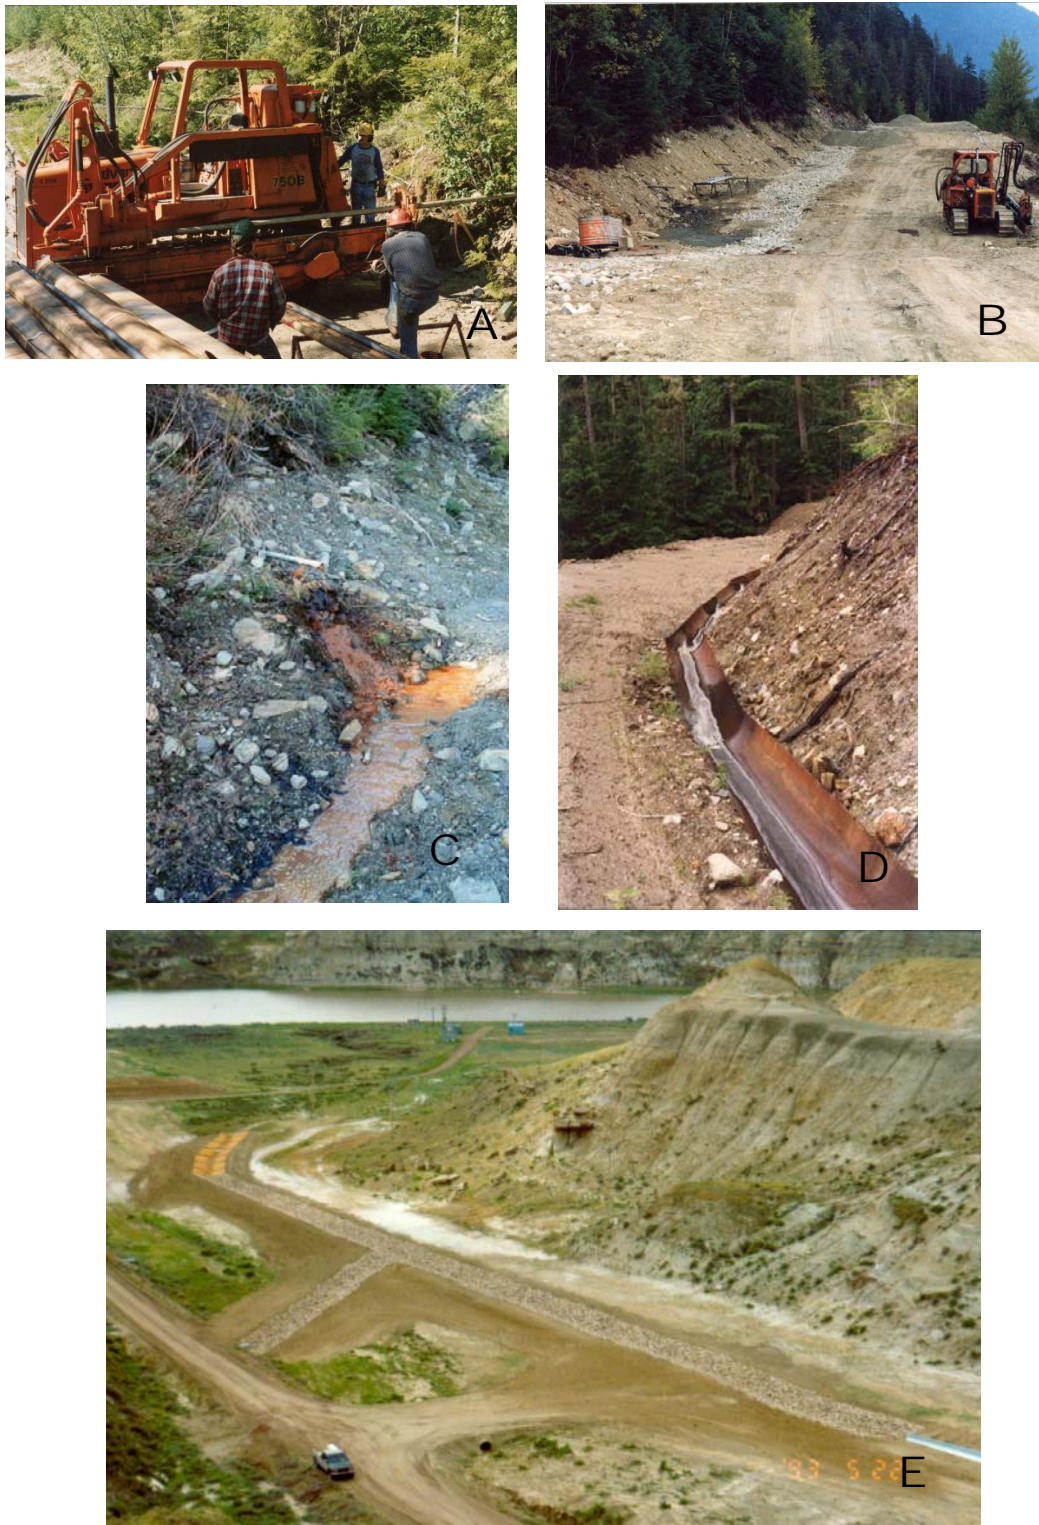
Slope stabilization using horizontal drains, (A) Drain installation, (B) Drains installed along base of slope, (C) Seepage from drains, (D) Routing of drained water, (E) Finished installation
